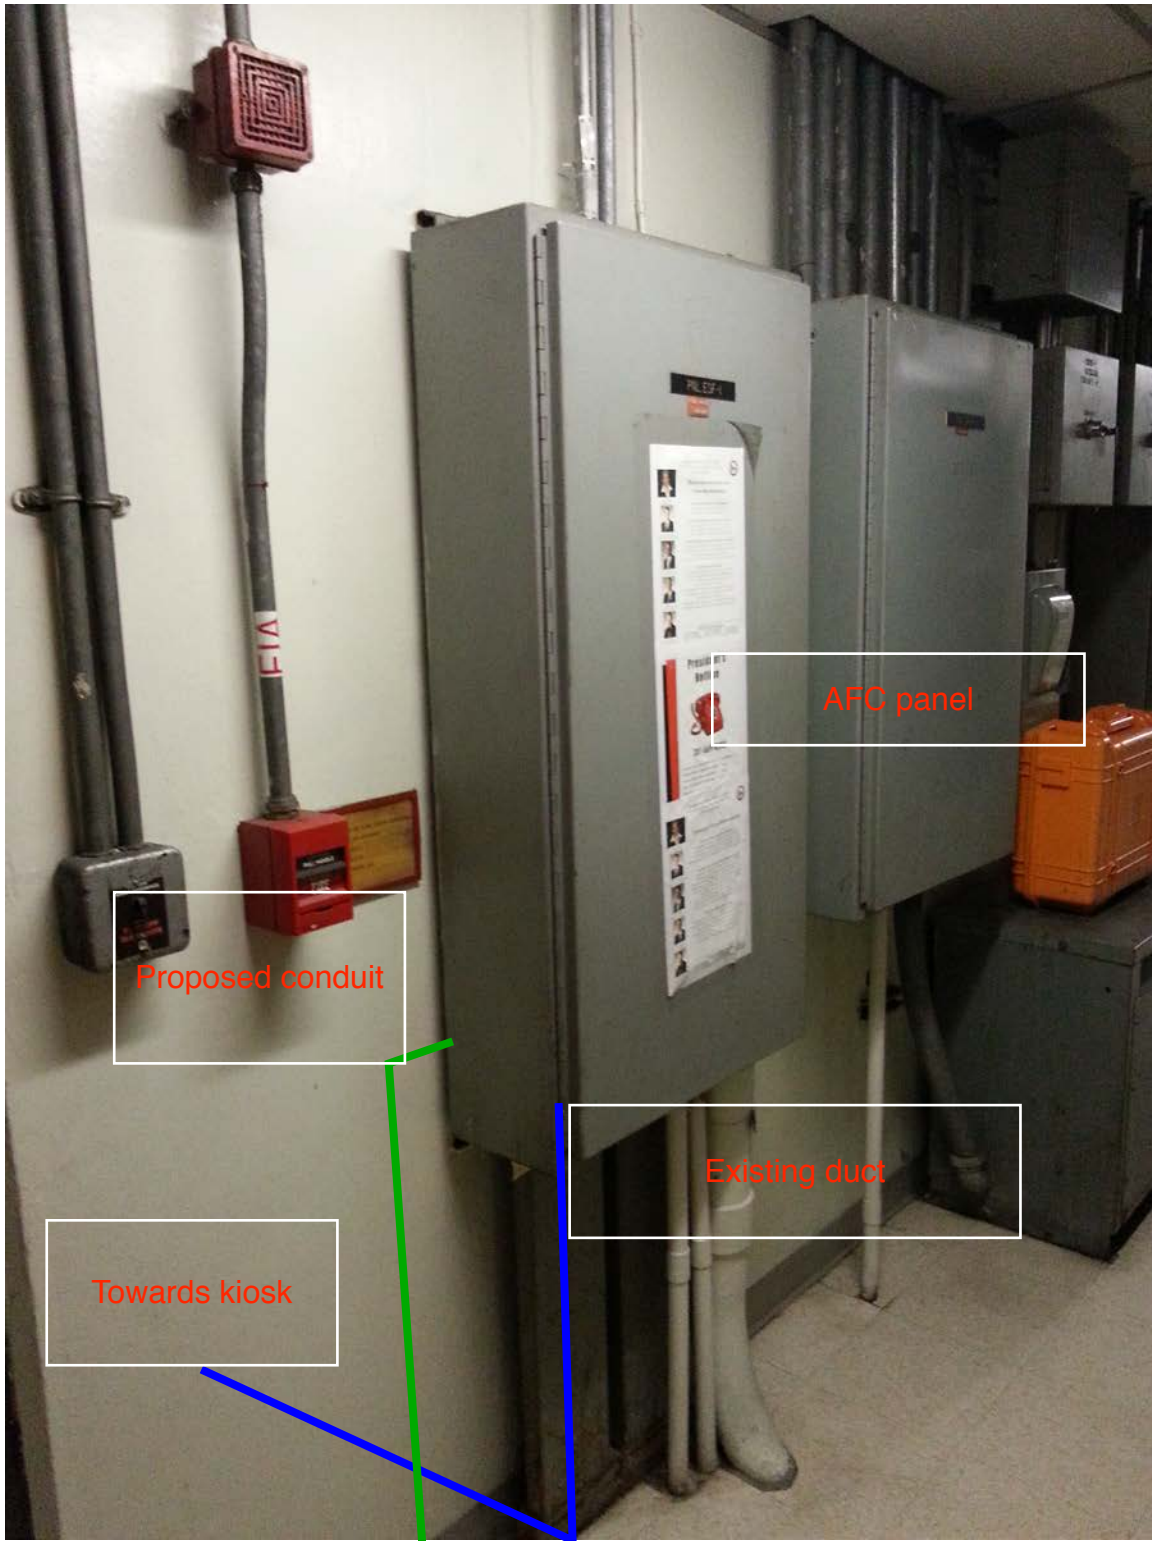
K07 Dunn Loring: Proposed and Existing runs towards AFC panel
